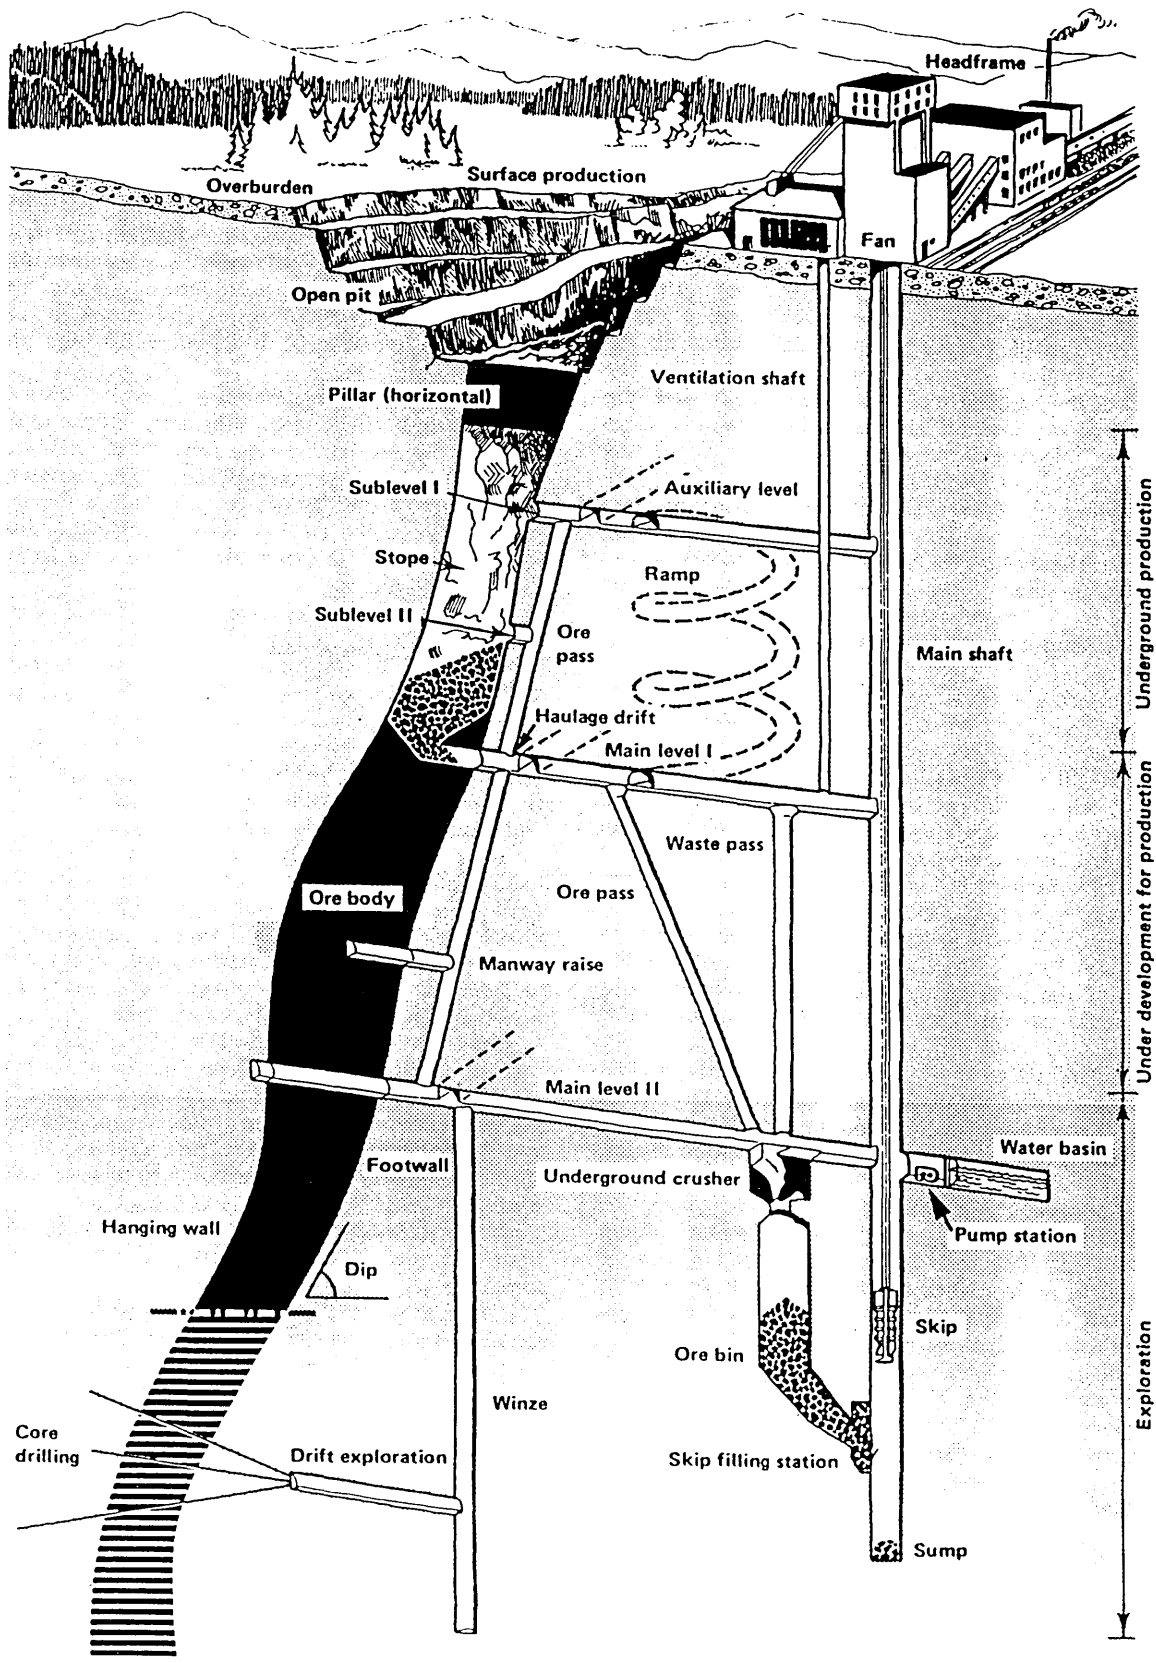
Schematic layout of a typical underground metalliferous mine (after Hamrin, 1982).
